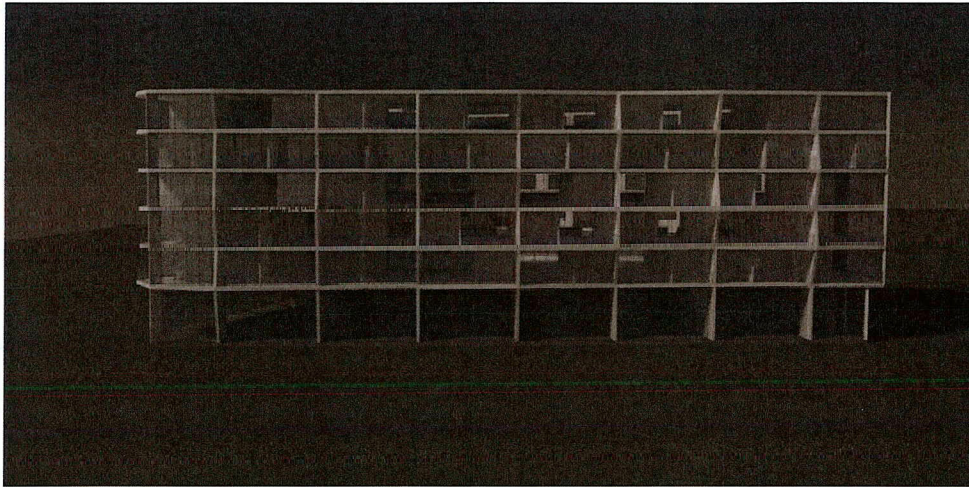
Elevation of Ground to Fifth Floor Level, as viewed from Lyall Bay. Reference Reve Architecture.
